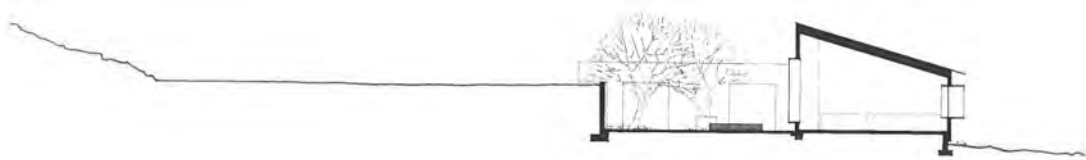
Section Through Courtyard and Main House [Image by Rick Joy Architects]
